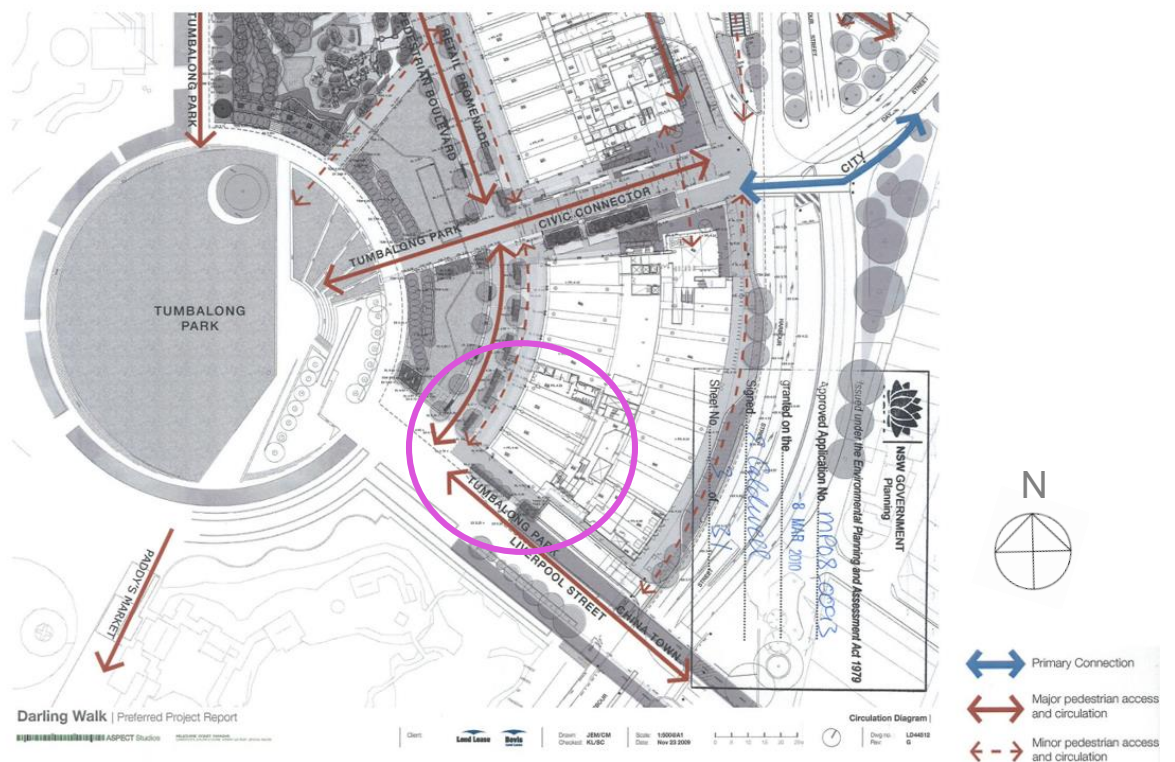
Subject site circled pink on stamped approved plan (MP08_0093)
